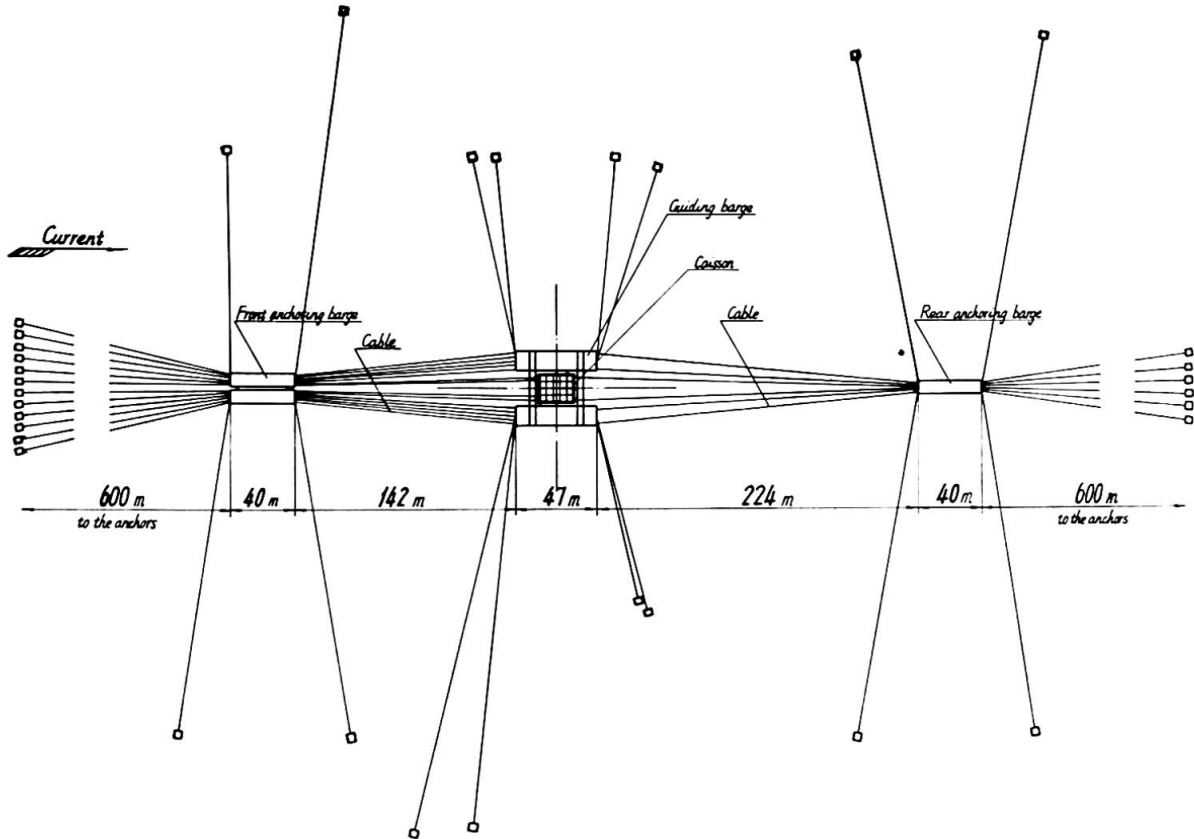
The Arrangement of Anchoring System of Pier No. 5
